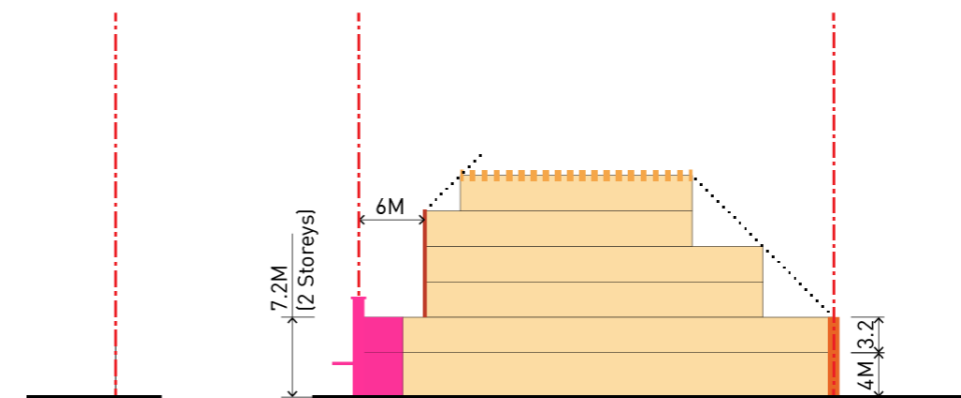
Proposed built form envelopes (section) in response to existing heritage building
